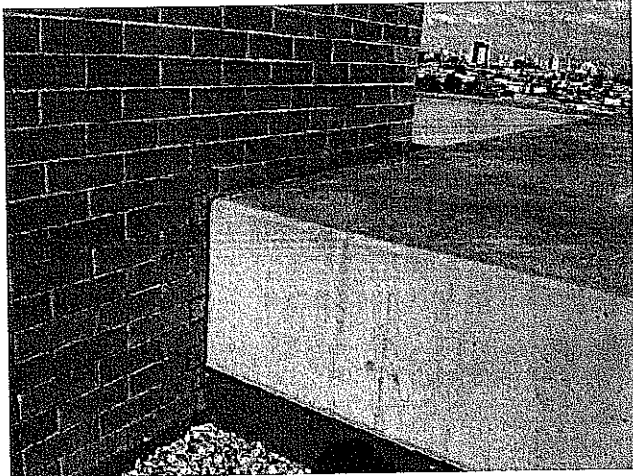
Typical masonry to concrete parapet interface at main roof.
